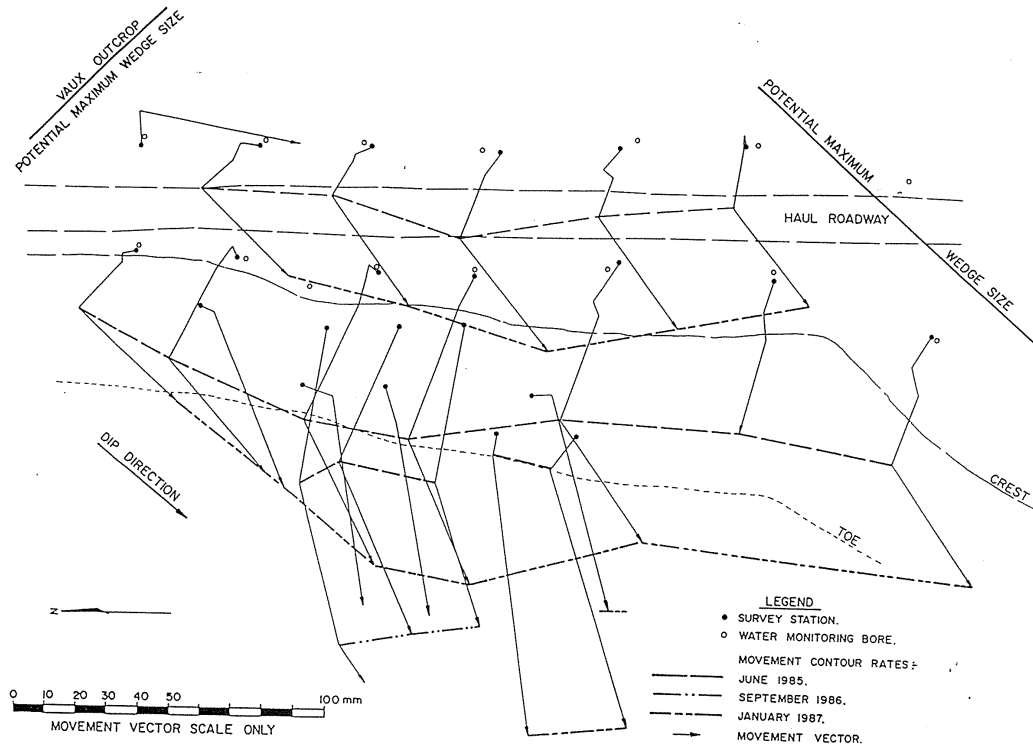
Plan of Saxonvale East Wall Failure
